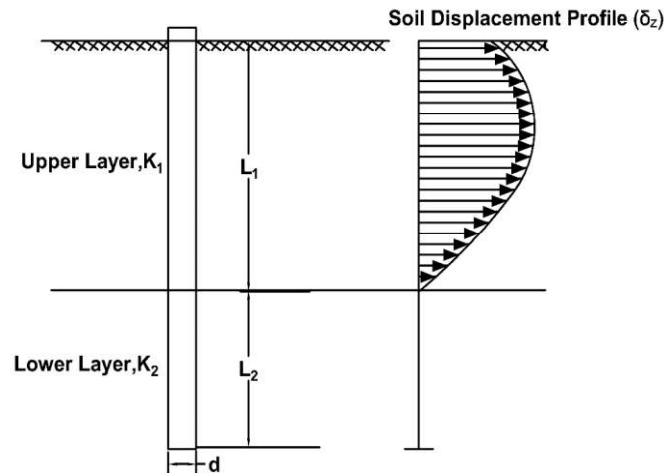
Schematic view of a pile undergoing lateral soil movement. Modified from Chaudhuri [15].
